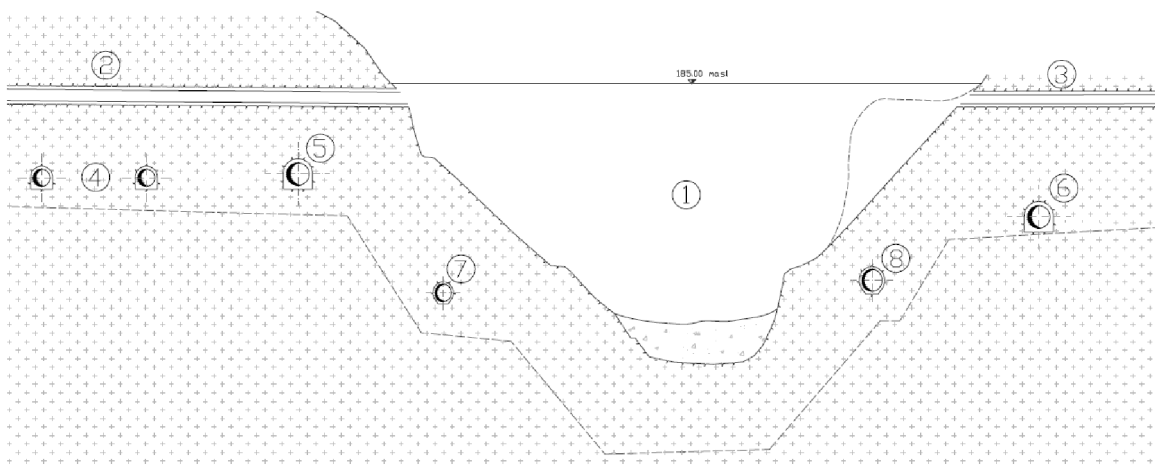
Longitudinal section of Koman Dam. 1: dam, 2: gallery, 3: gallery, 4: power waterway, 5: tunnel spillway No. 4, 6: tunnel spillway No. 3, 7: diversion tunnel No. 2, 8: diversion tunnel No. 1
